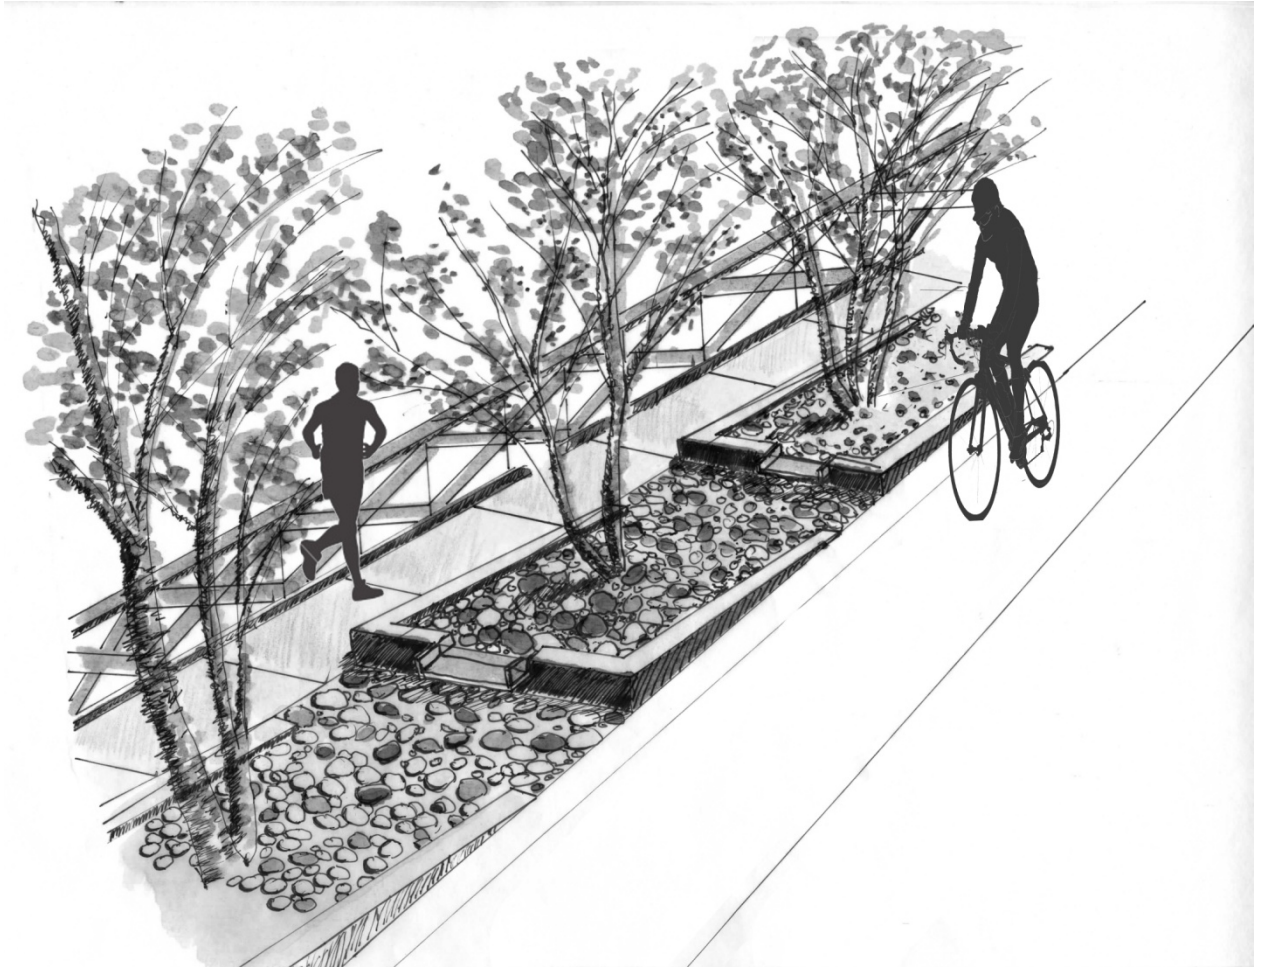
Perspective Drawing showing Green Street on Bridge Over Existing Rail Corridor (Busa)
